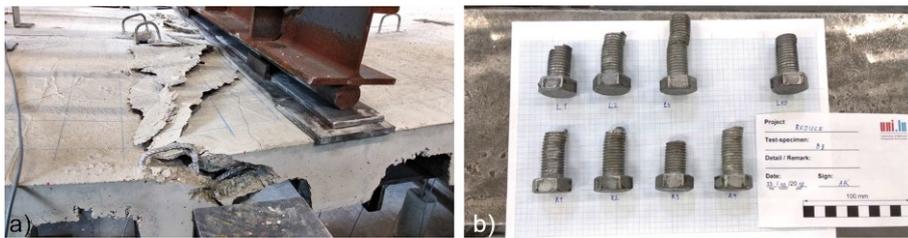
Failures observed from beam tests: a) concrete failure, b) bolt failure
